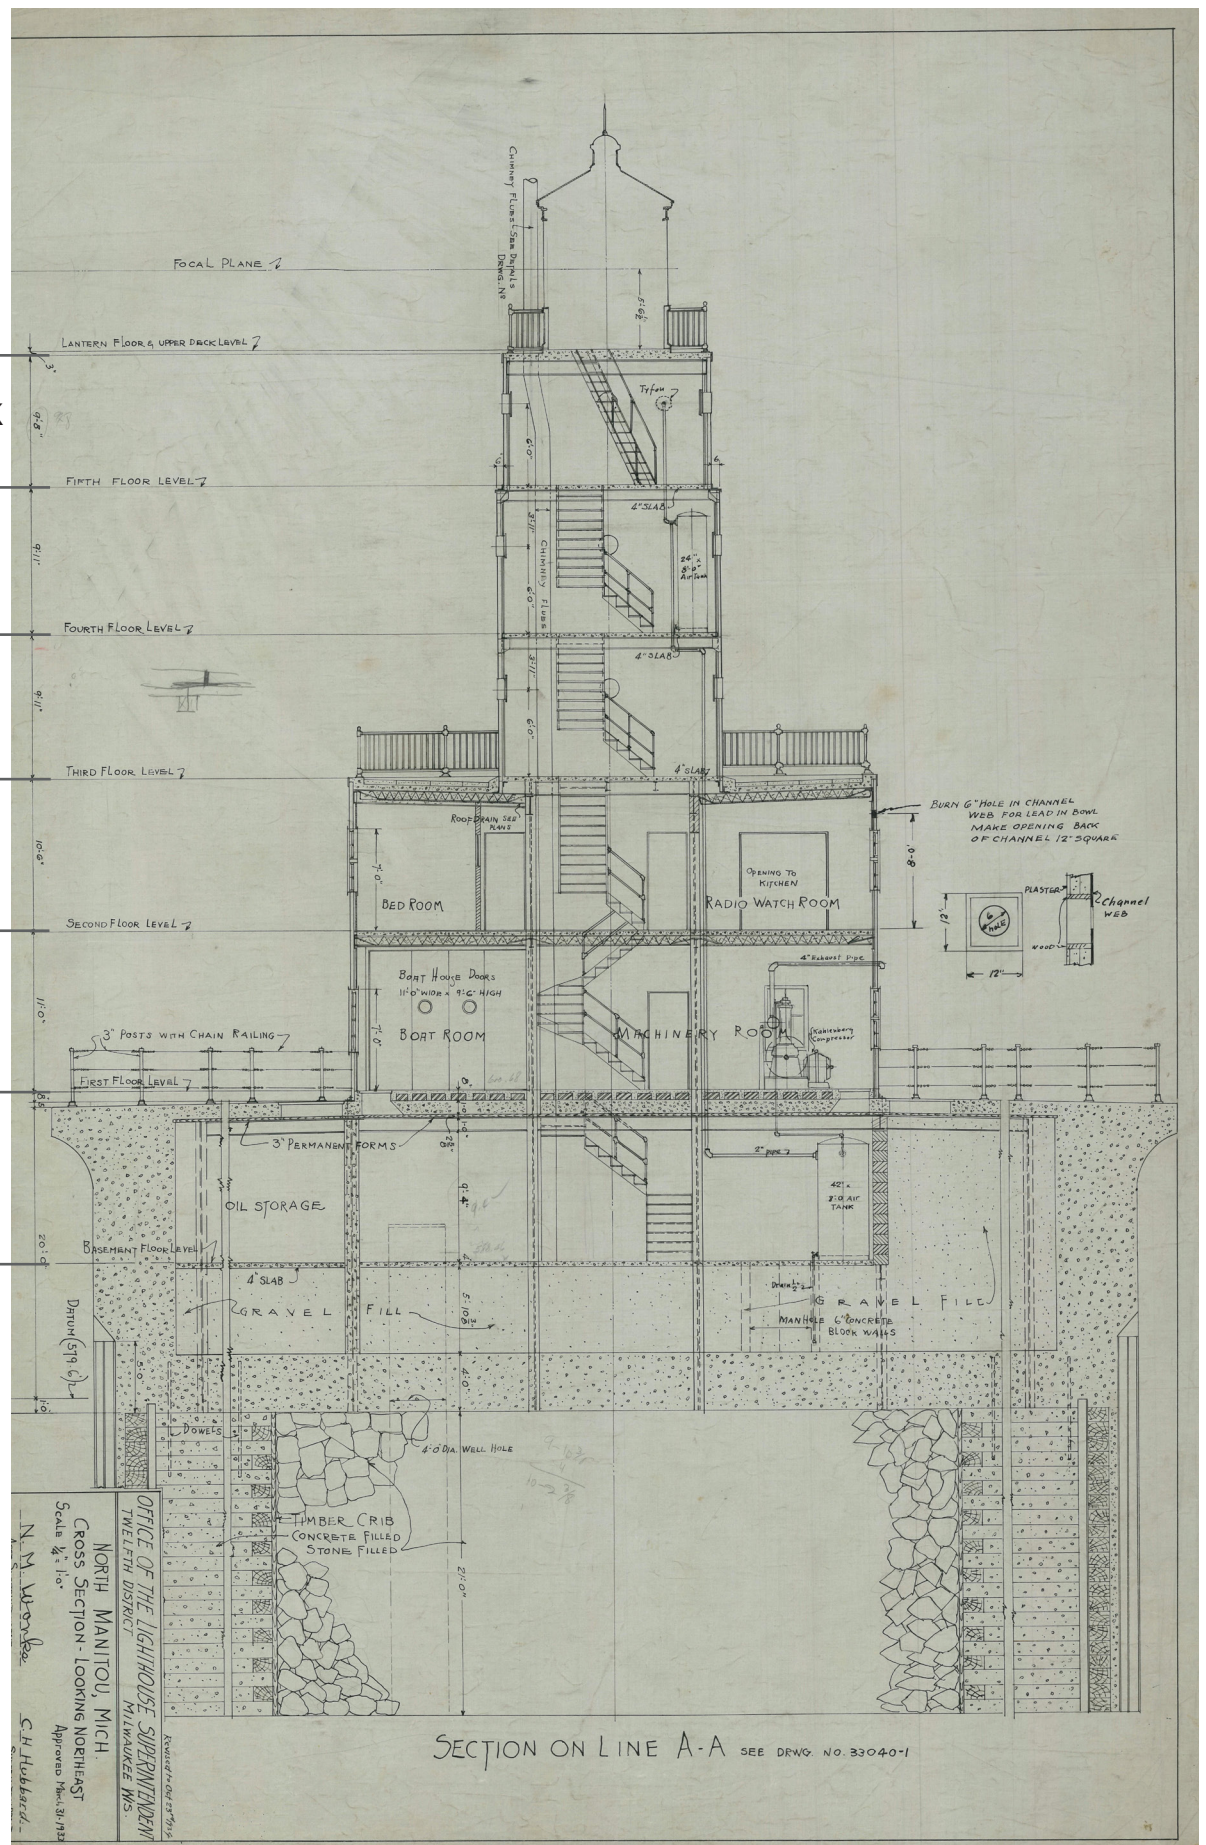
D-01: Section drawing of the North Manitou Shoal Light Station
